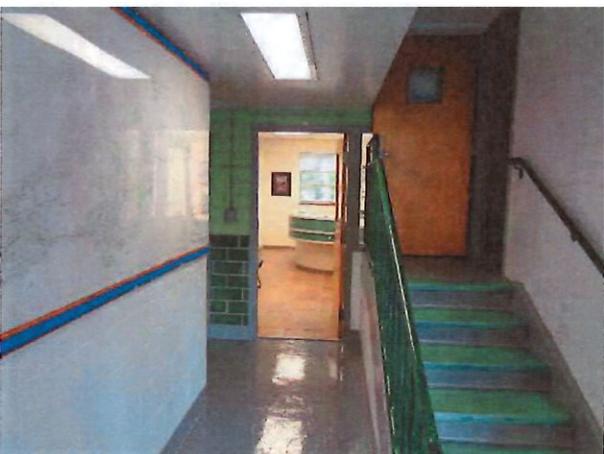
Door leading to office and stairwell to 2<sup>nd</sup> floor
